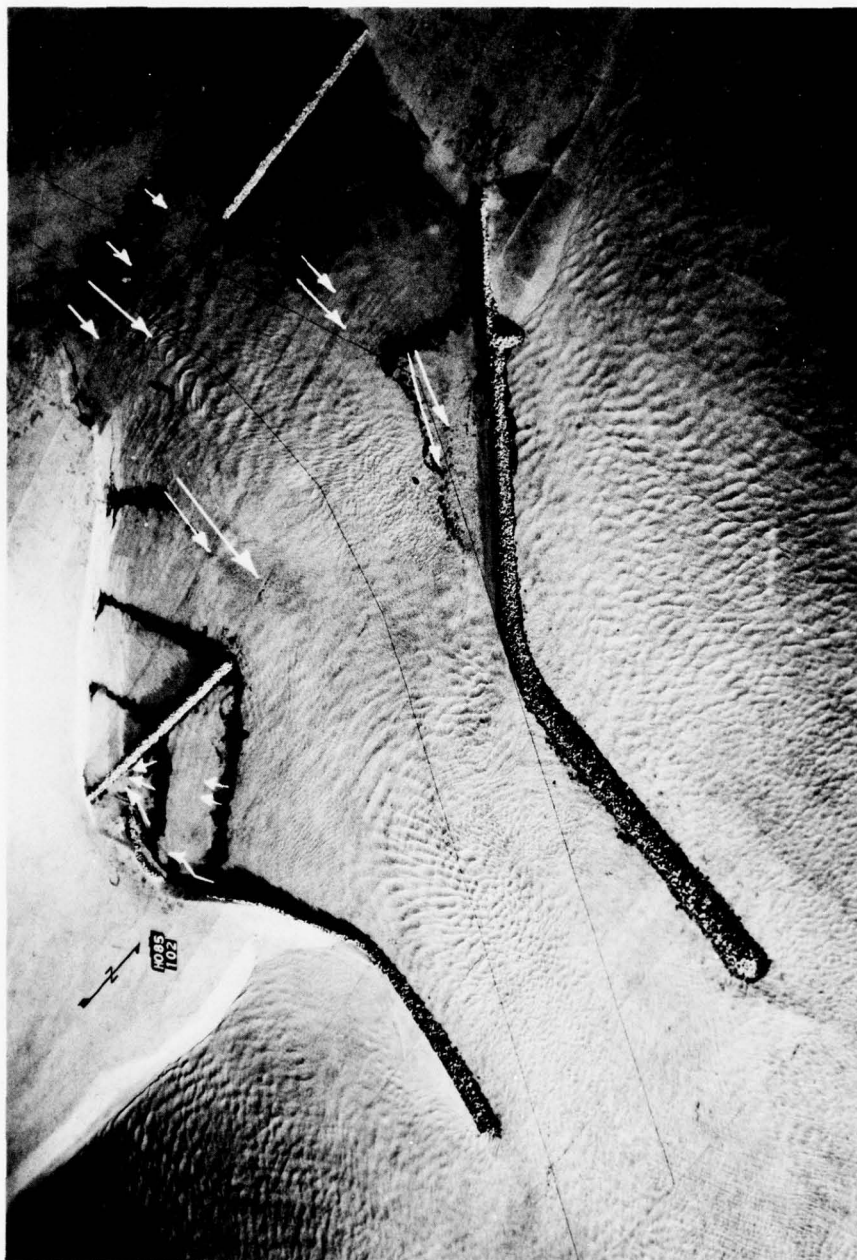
Typical tracer movement for plan 4A resulting from 7-sec,
